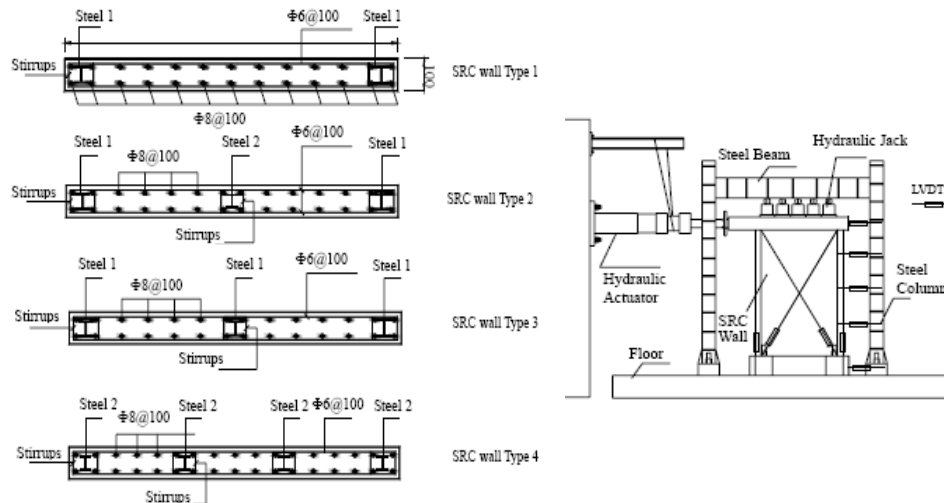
Wall specimens and test set-up. Xilin Lu & Yuguang Dong
